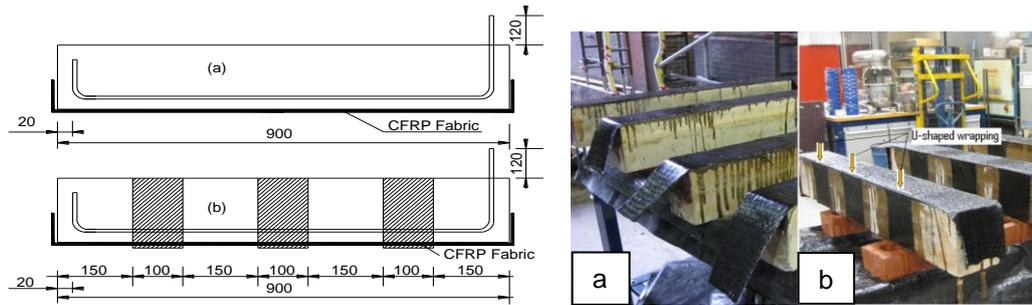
Beams repaired by CFRPs fabric: a) Group beams 1; b) Group beams 2
